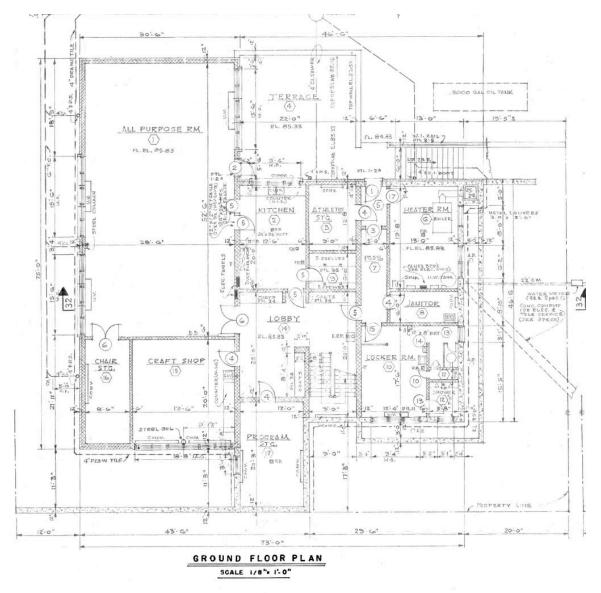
Hunton YMCA Ground/Basement Floor Plan from 1954 Architectural Drawings. Courtesy of Jones Memorial Library.
